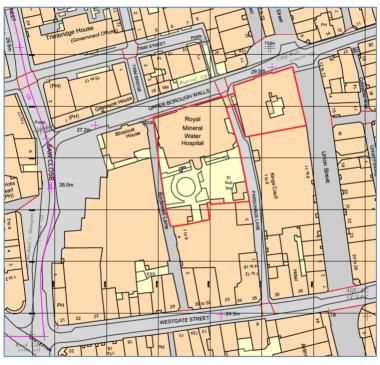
Extract from the Site Location Plan (CD Ref: 4A)
